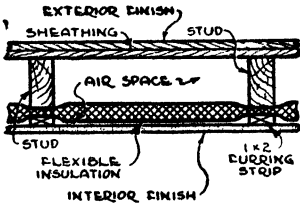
Application of Flexible Insulation to Face of Stud with Furring Strips over Insulation for Attaching Interior Finish
